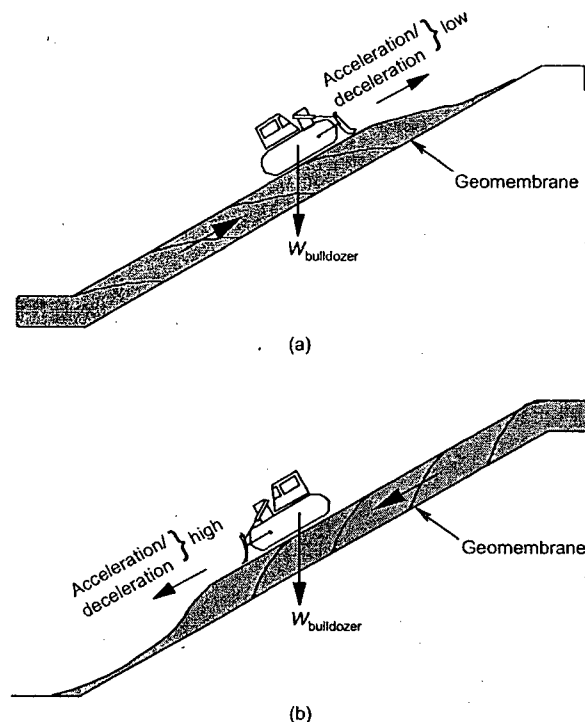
Construction equipment placing cover soil on slopes containing geosynthetics: (a) equipment backfilling up slope (the recommended method); (b) equipment backfilling down slope (method not recommended)
